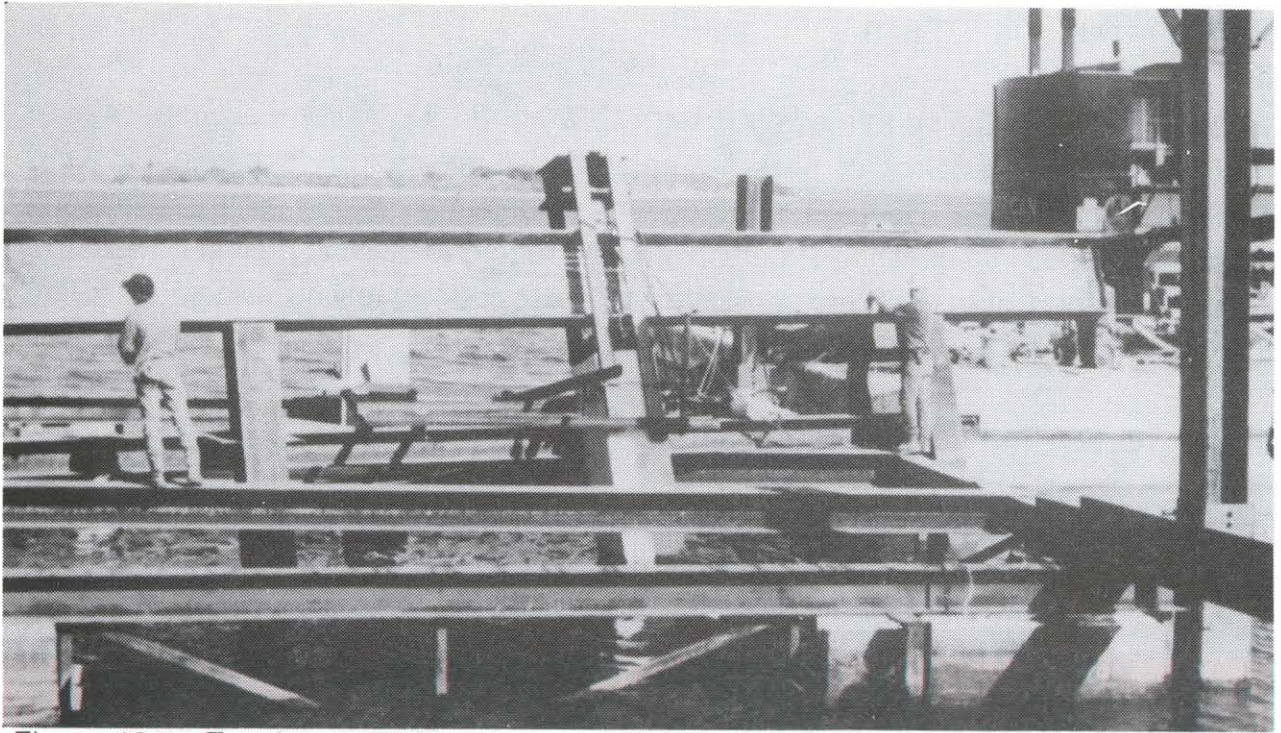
Tension Load Test Arrangement on Batter Pile (courtesy of Florida DOT)
